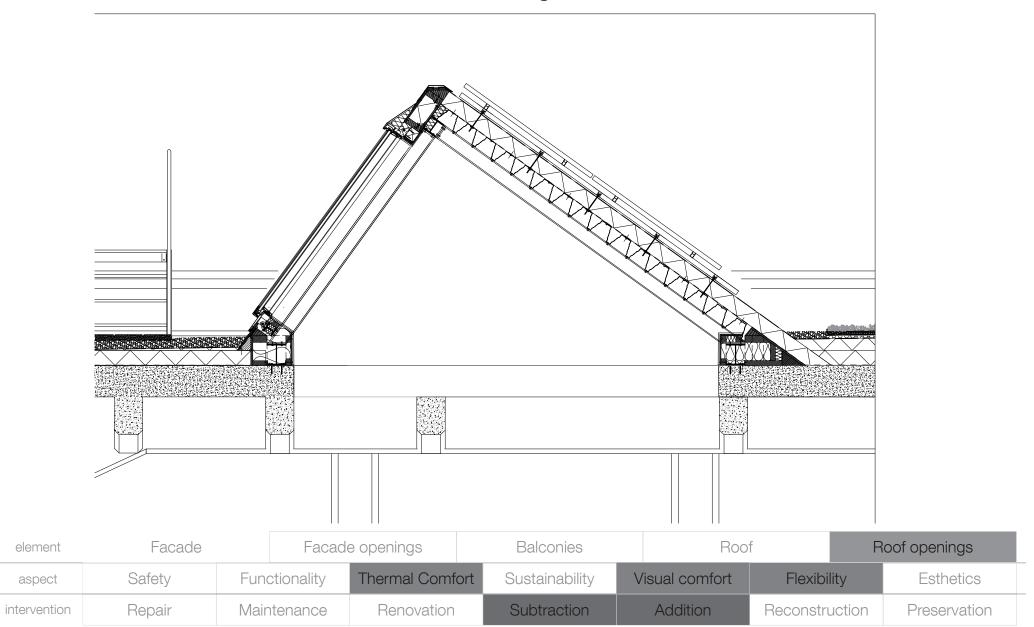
Section A-A' showing daylight in compartment after installing new rooflight, source: own image
